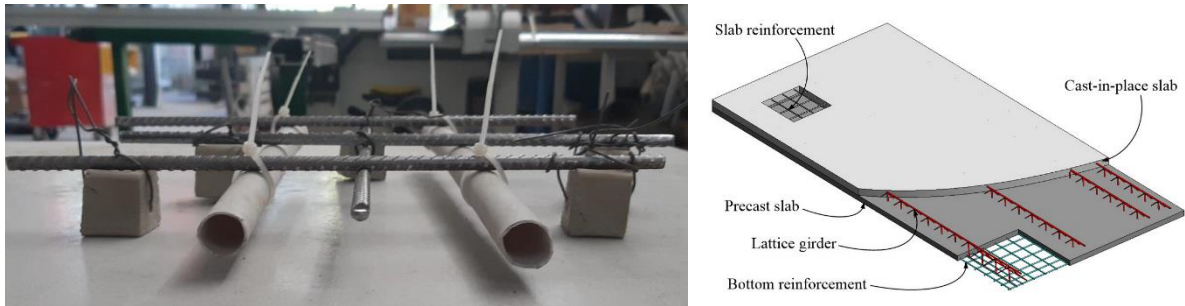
Reinforcement and PVC tube layout of the specimens (left), Latticed girder composite slabs (LGCS)<sup>7</sup> (right)
